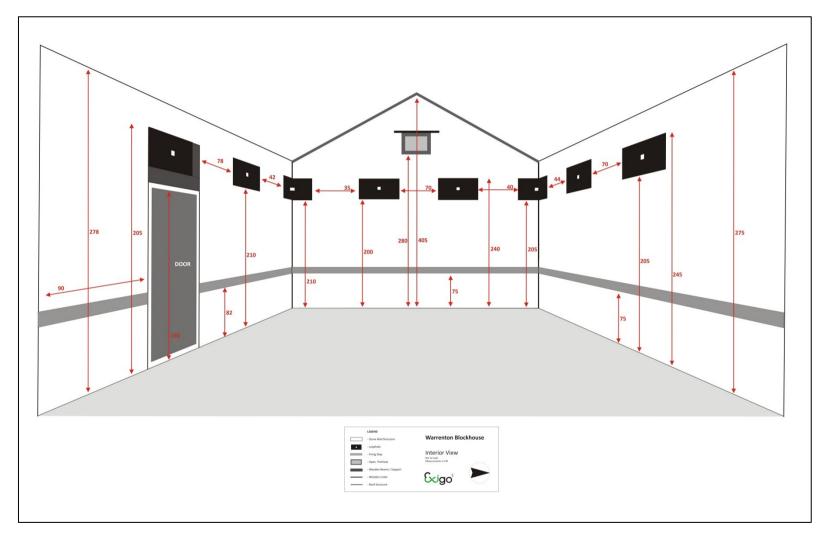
Plan of the interior (south, west, north) of the Warrenton blockhouse structure.
